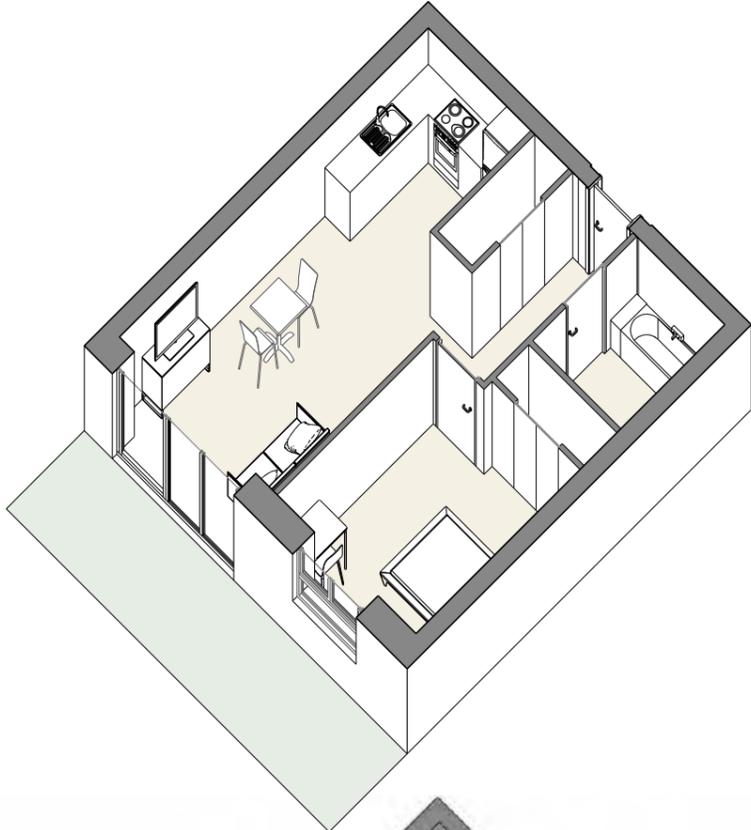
Typical 1 Bedroom 2 Person Wheelchair apartment (Plot E)
